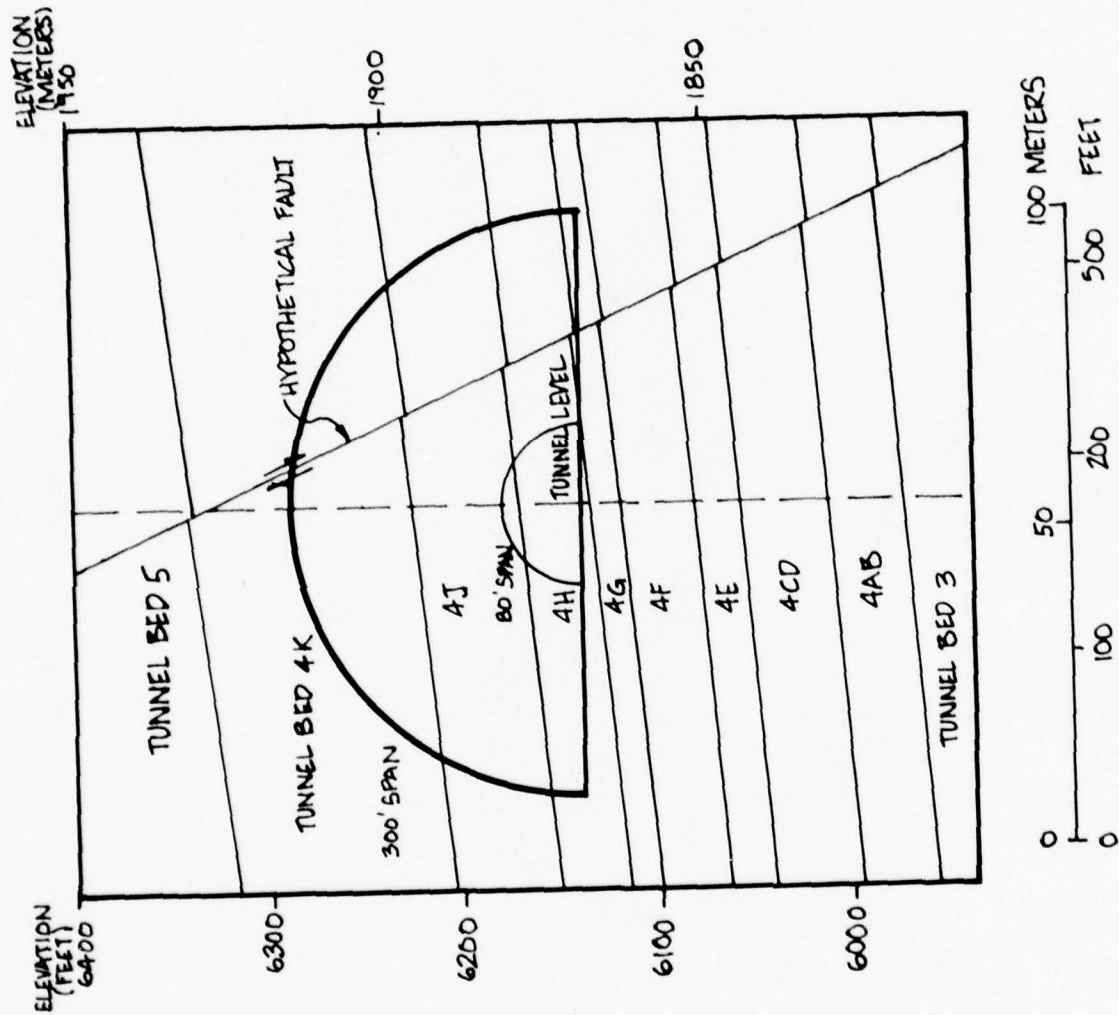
CROSS-SECTION THROUGH TYPICAL TUNNEL BED 4 SITE
